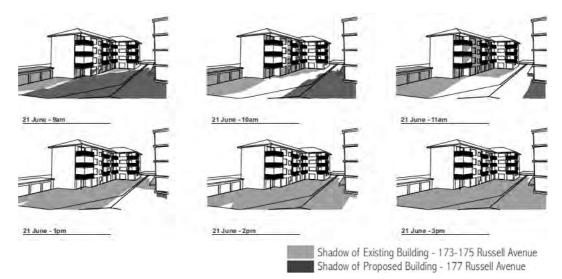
Potential shadowing – existing buildings vs proposed height (Winter) – shadow cast by existing trees not shown
